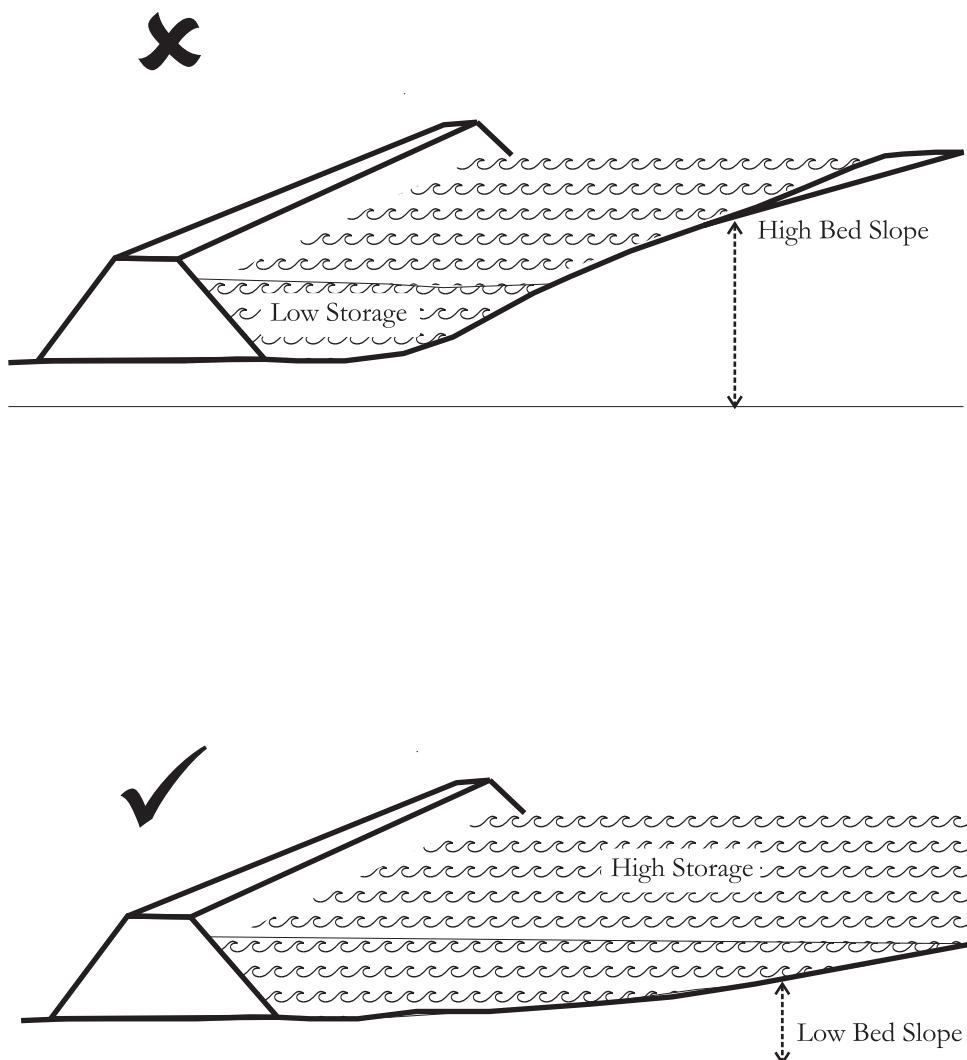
The upstream bed slope of the drainage line at the point where the structure will be located should be low
